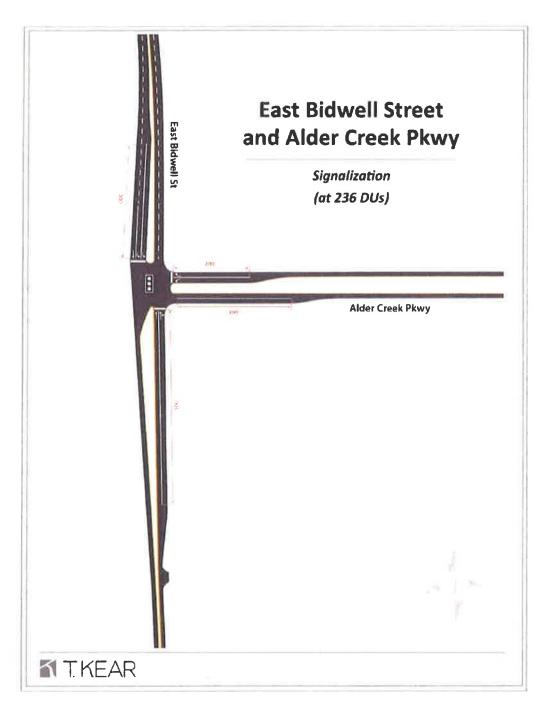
East Bidwell Street/Alder Creek Parkway
